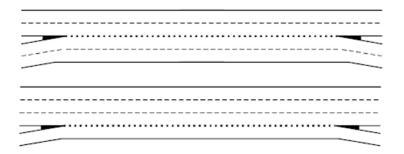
Two examples of symmetrical weaving sections [25, p. 38]
